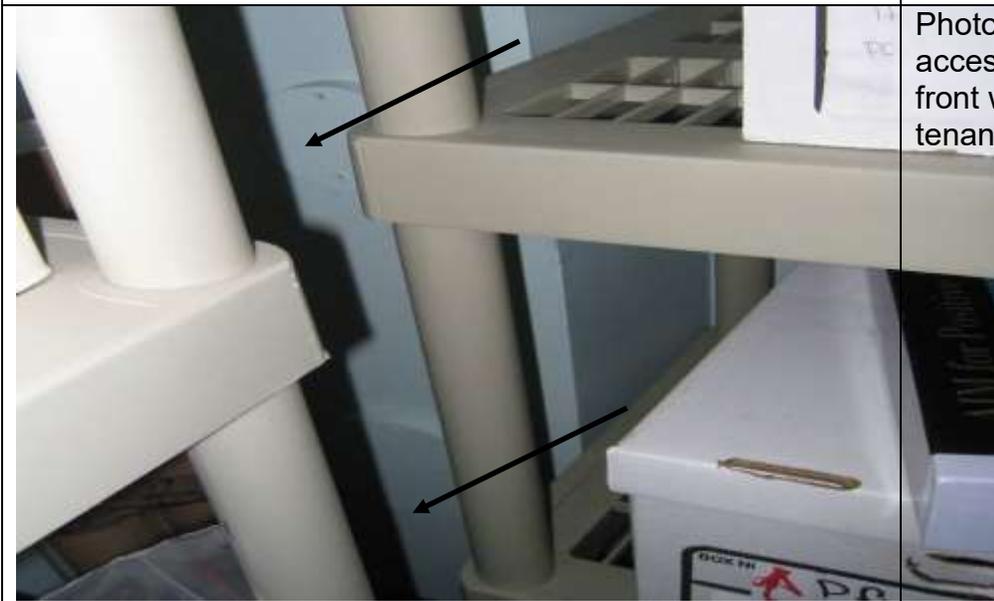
Limited view and access to plumbing cleanouts; front west basement wall in tenants suite
